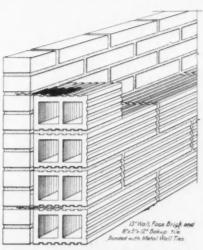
The 13-Inch Wall Bonded with Metal Ties in Place of Masonry Bond,
